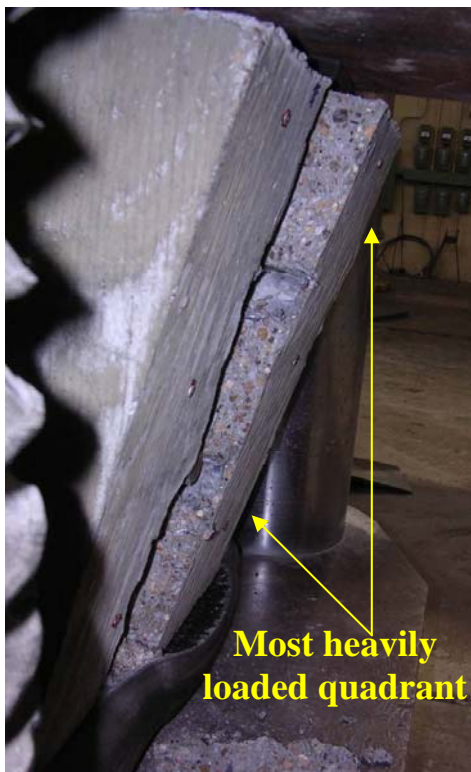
Wedge Pushing Out at Base of Cracked Control Specimen
